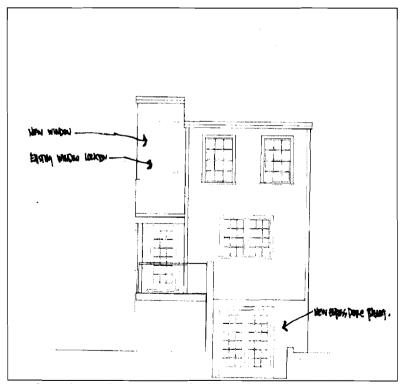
Proposed east (rear) elevation. New basement doors not visible from public right-of-way.
